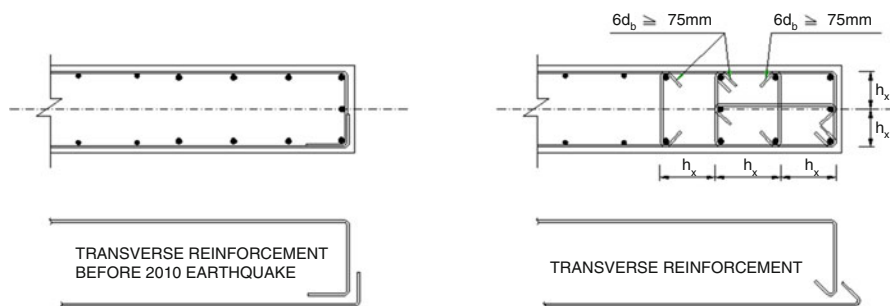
Transverse reinforcement in walls, before and after the 2010 earthquake
